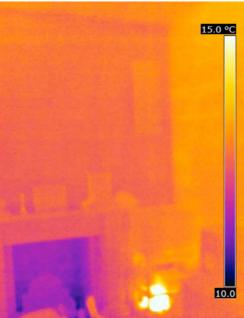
Photograph of the east wall postintervention, showing the junction between the south east wall and the ceiling
